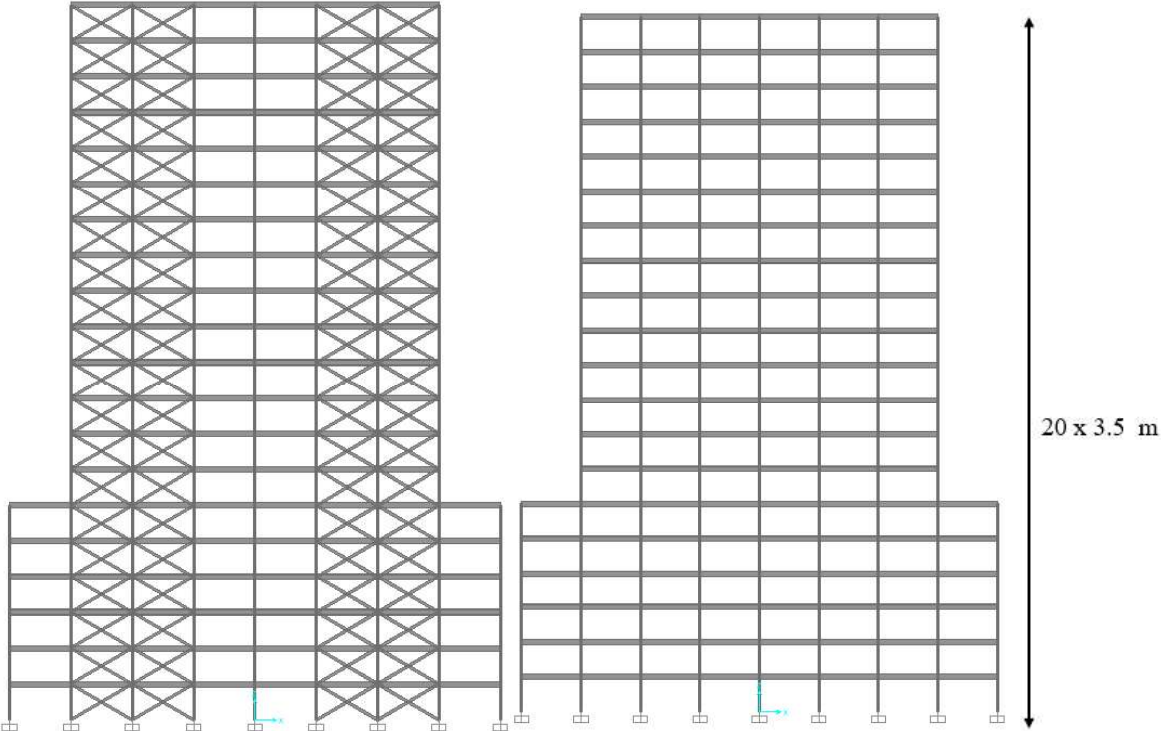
The elevation views of the 20-story steel structure with 3860 members in X direction.
